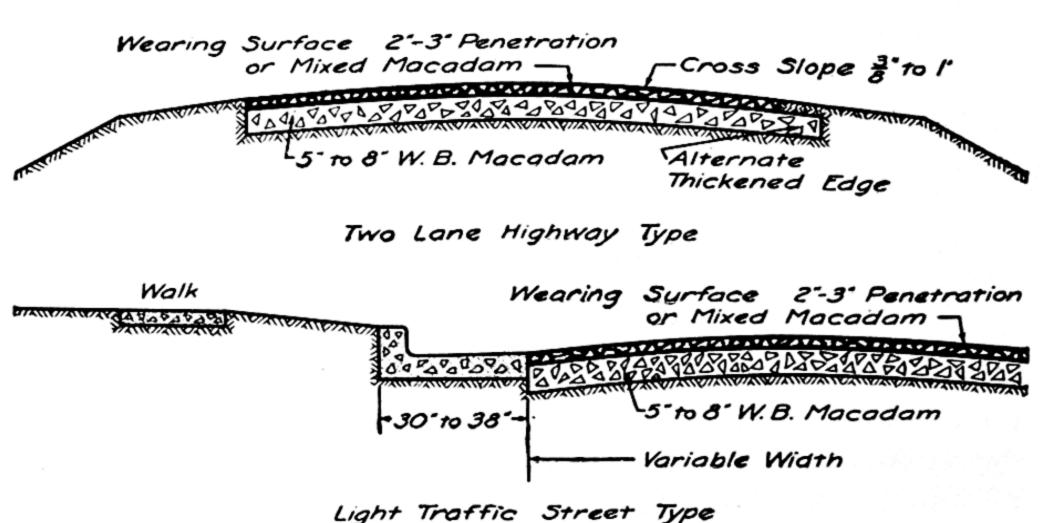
Typical cross-sections for penetration or mixed macadam roads and streets.
